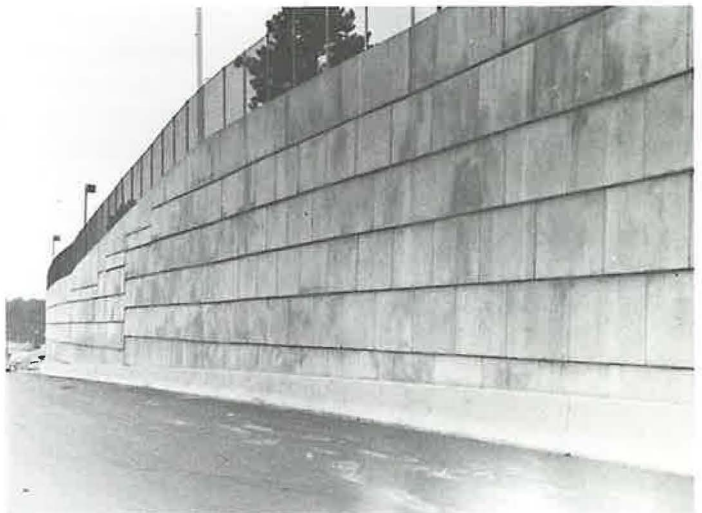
Doublewal construction near I-75 Northwest, Atlanta.
